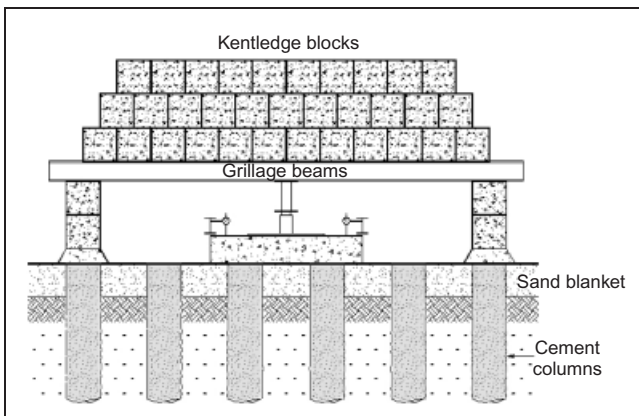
Schematic diagram showing four-column plate load test set-up (Raju¹¹)
